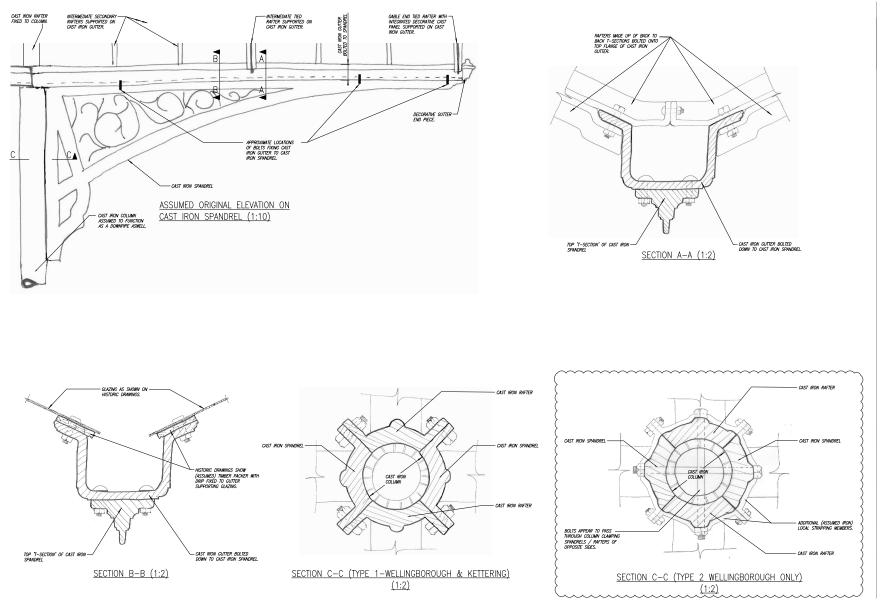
Sketch drawing from observation of existing 1857 and 1883 canopies on platforms 1 showing bracket details
